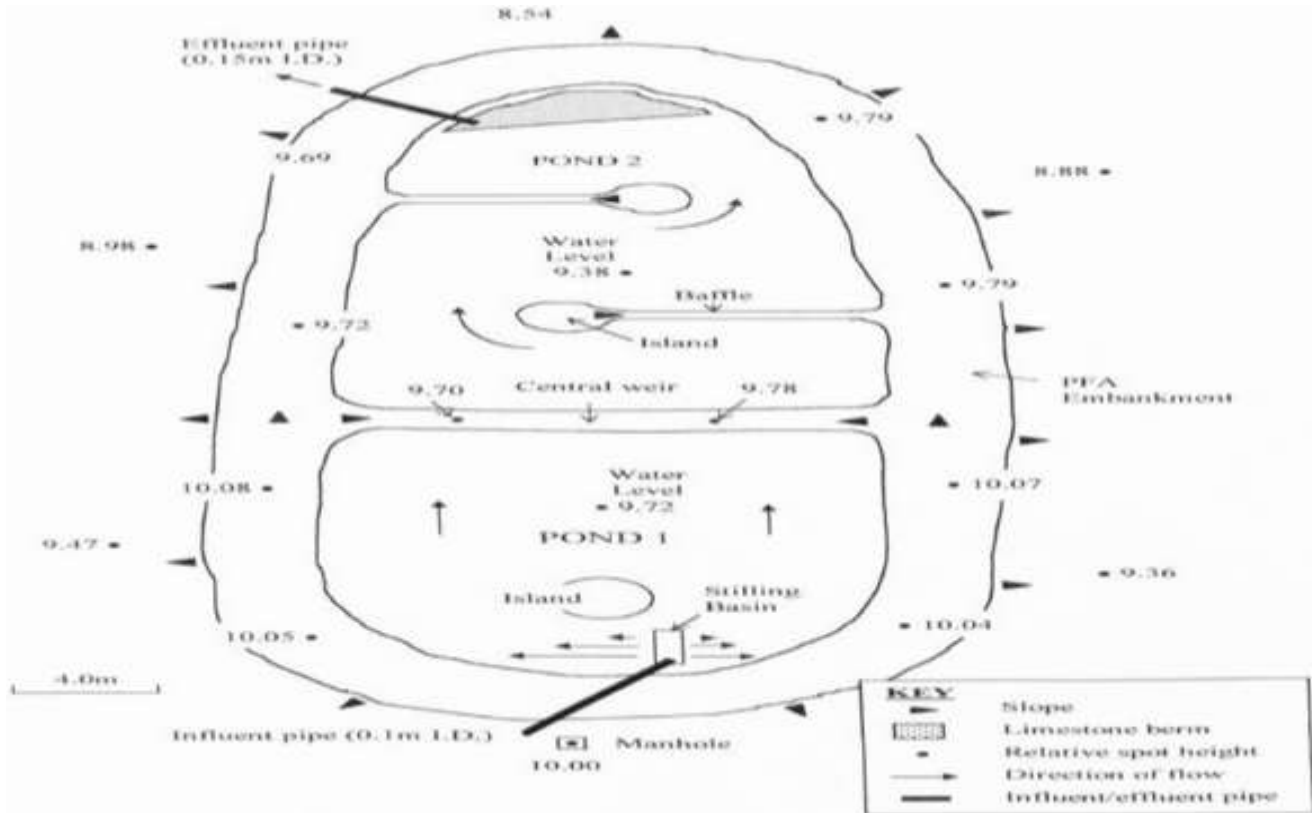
Proposed structure with construction materials for Pond 1 and Pond 2.
